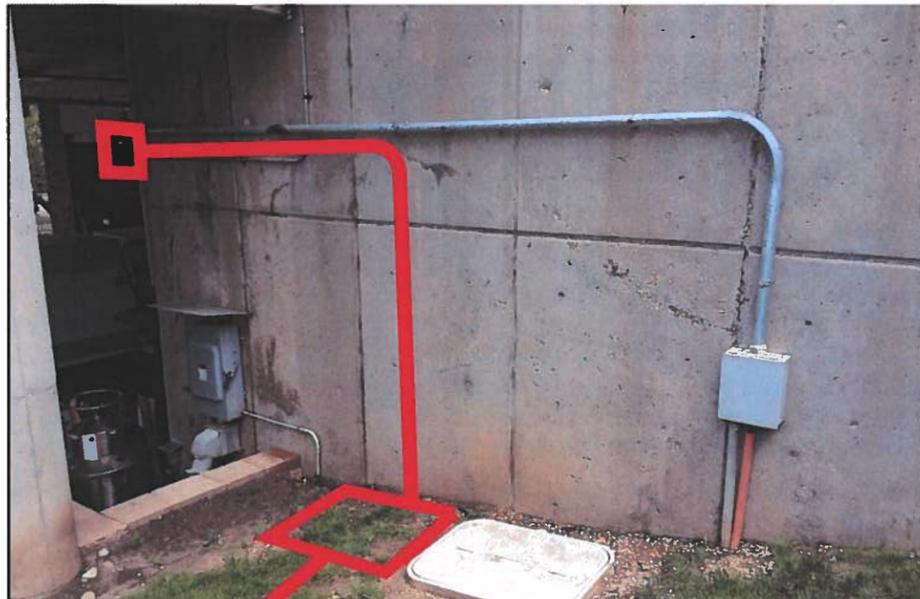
PROPOSED HANDHOLE AT BUILDING, PROPOSED PATH FOR 2" EMT CONDUIT FROM HANDHOLE TO PROPOSED SMALL PULLBOX FOR 90° BEND. (FACING NORTHWEST) - SECTION A-A
